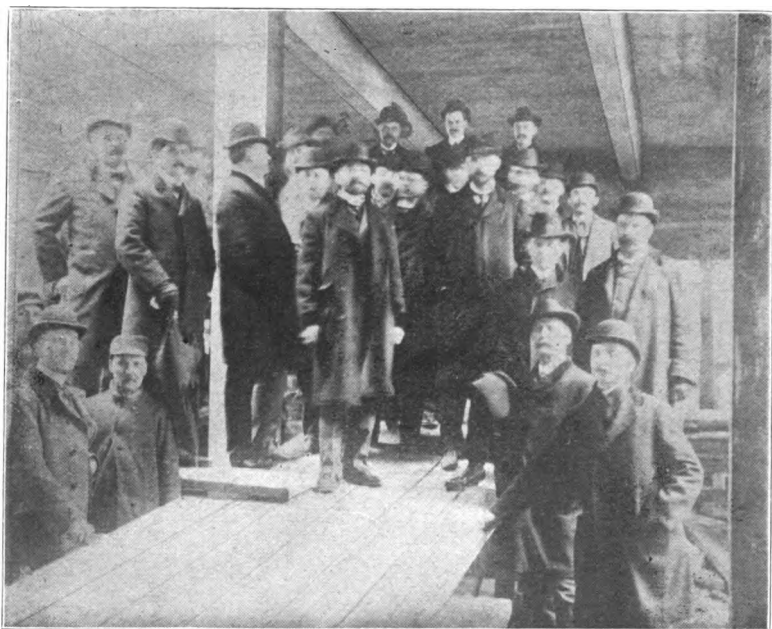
Test of Girder, Salvation Army Building, Cleveland, O.
